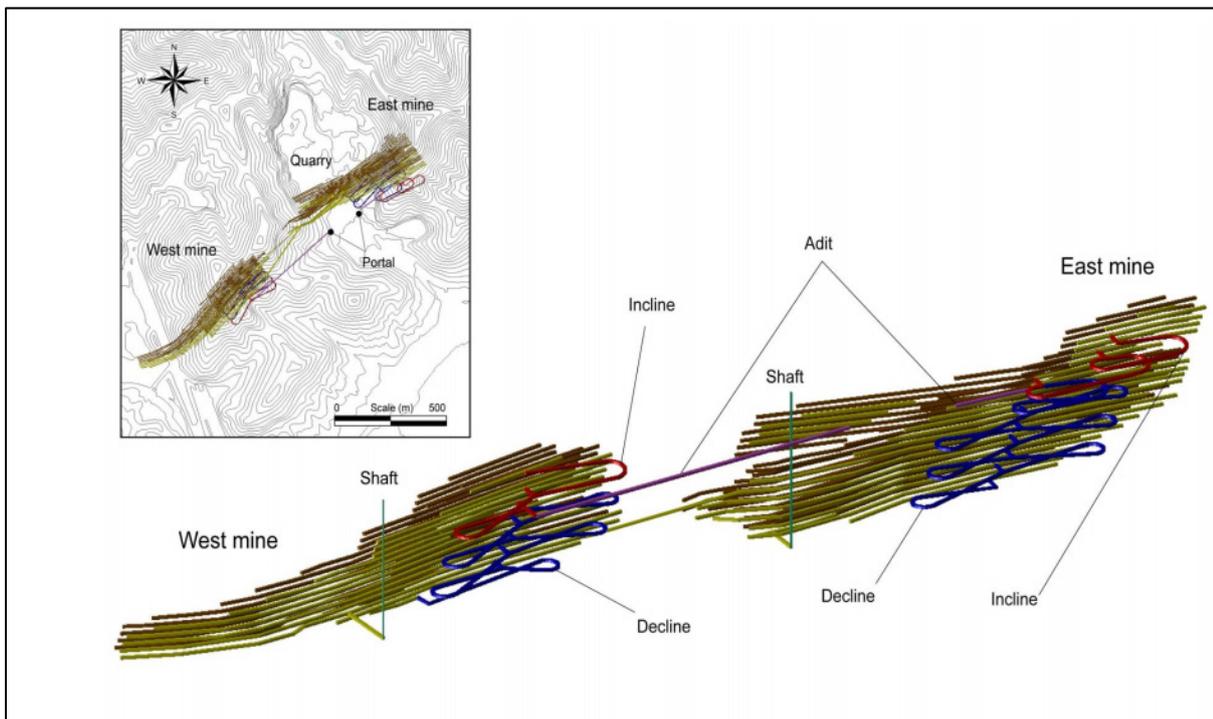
General layout of proposed underground access surrounding the quarry in Yogwang
